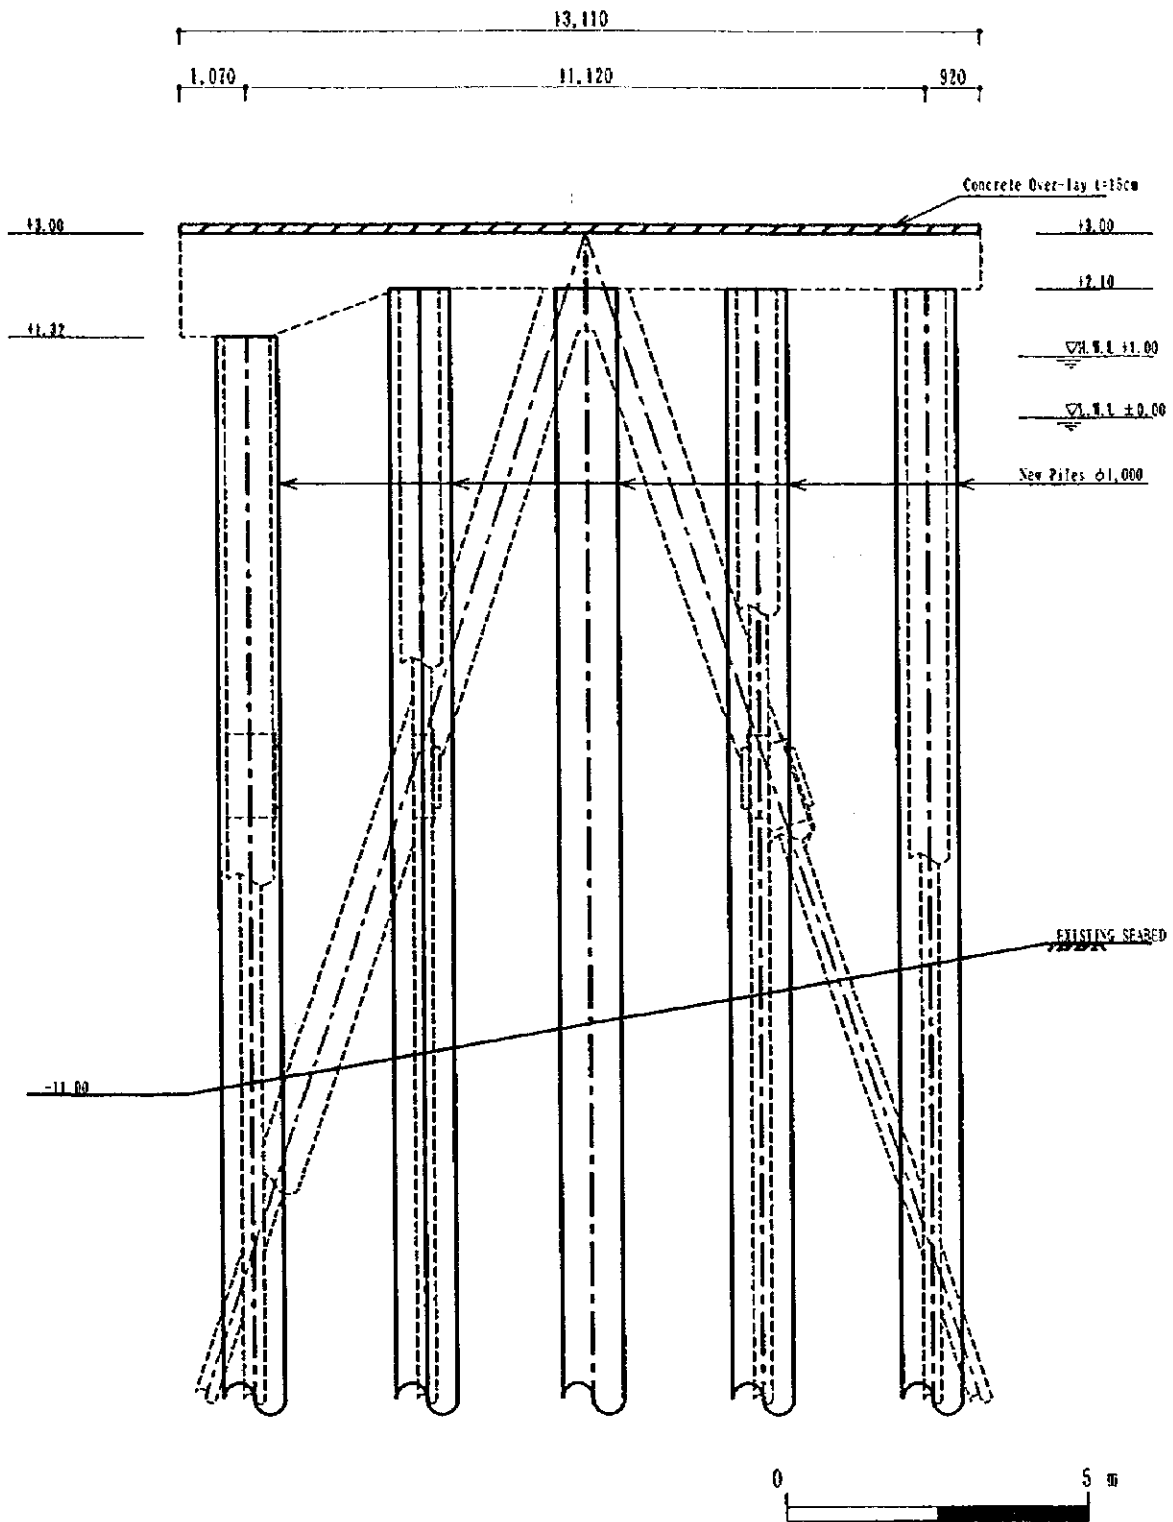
Cross Section of Reinforcement of Existing Wharf (Alternative Plan 3-2)
